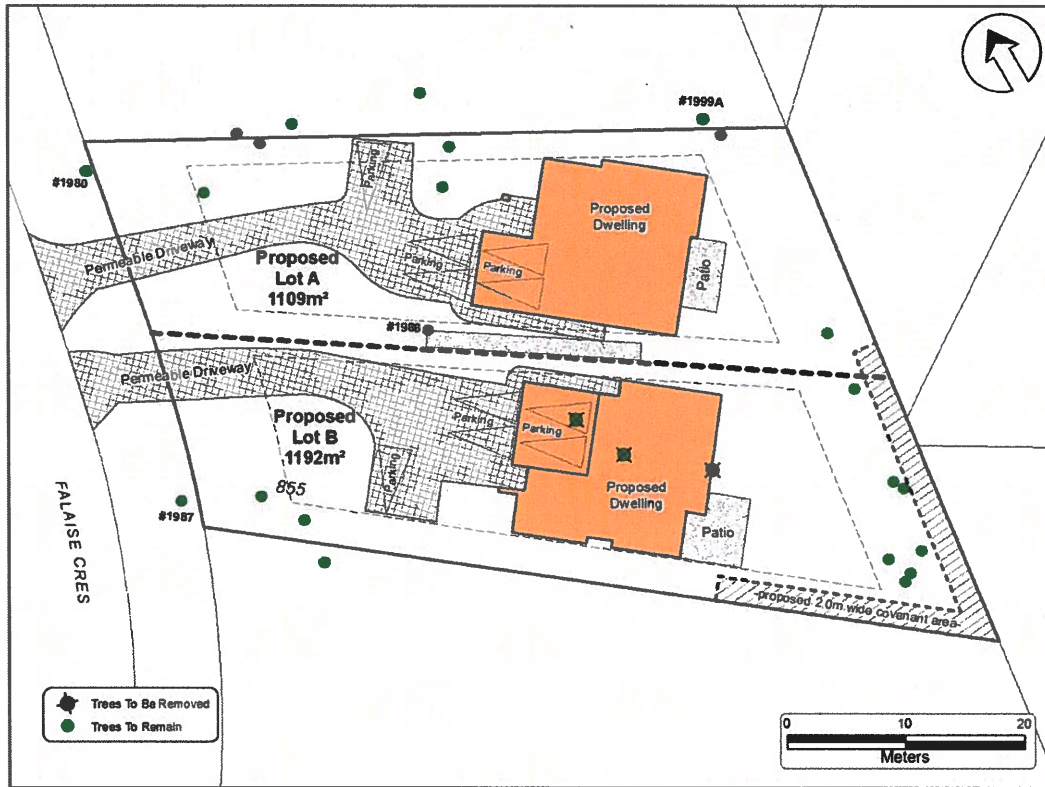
Revised Site Plan dated June 11, 2020 (from plans by Outline Home Design)
